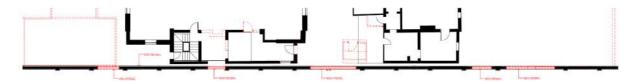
Proposed penetrations along heritage wall to connect northern and southern sections of site (Source: FJMT, DA-5001, SSDA01, 18.12.19)
